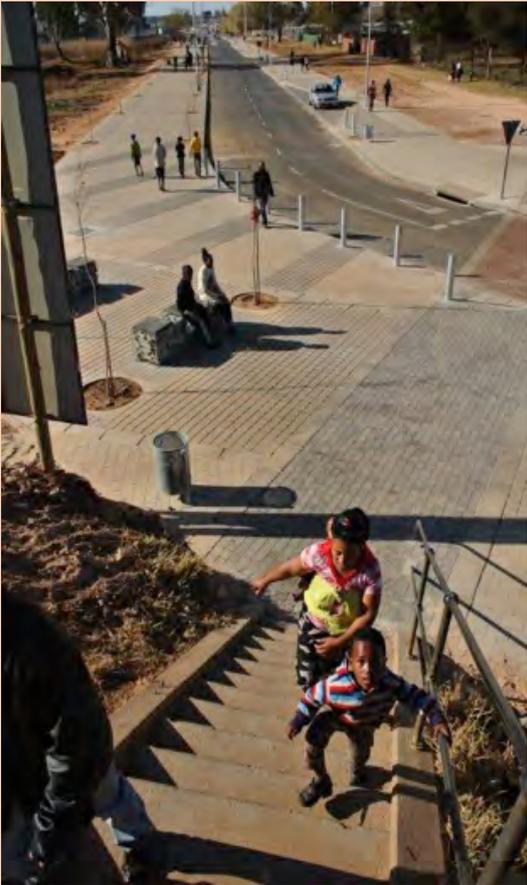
Construction of walkways and cycle ways in Thokoza Park/Soweto
